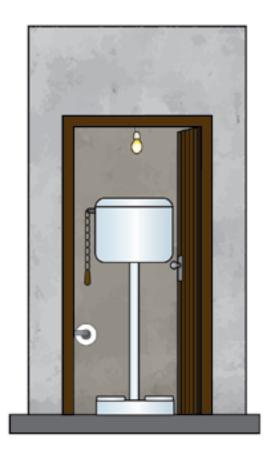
SCHOOL WC TOILET BLOCK AND STAND INTERIOR
